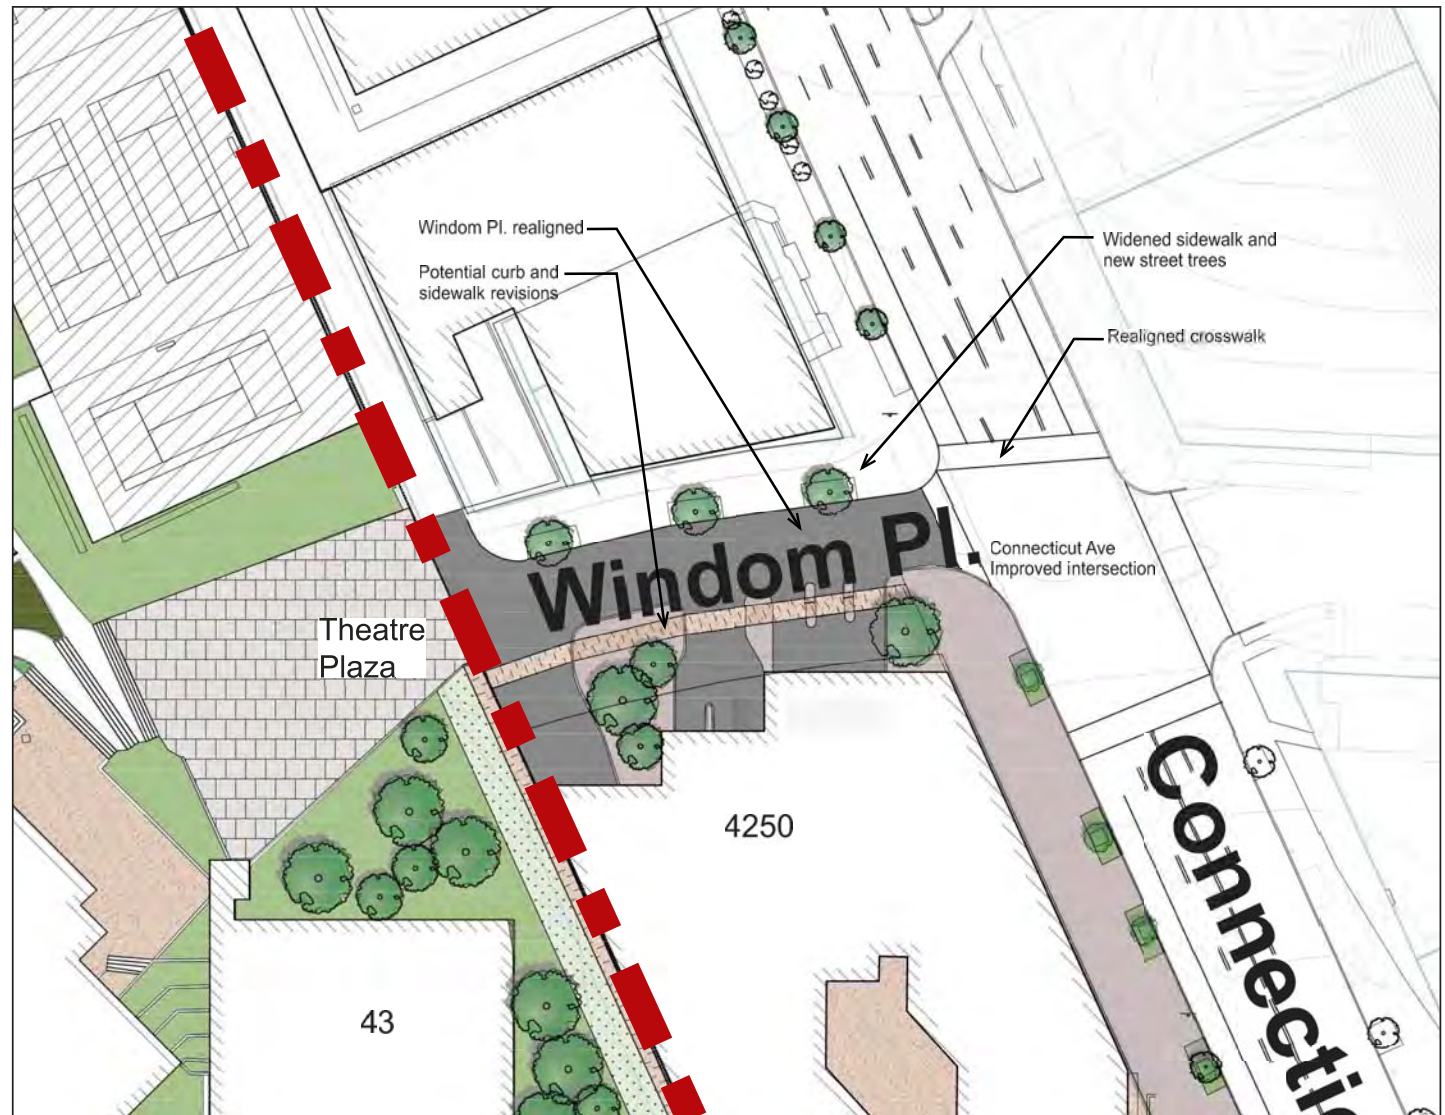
B PROPOSED CAMPUS ENTRY - WINDOM
